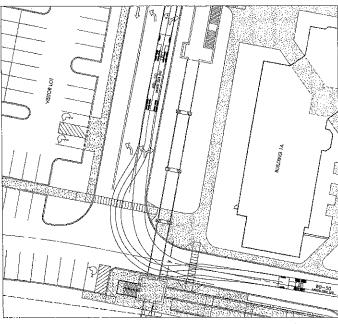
SITE TO CHURCH WALK: RIGHT TURN (WB-50)
